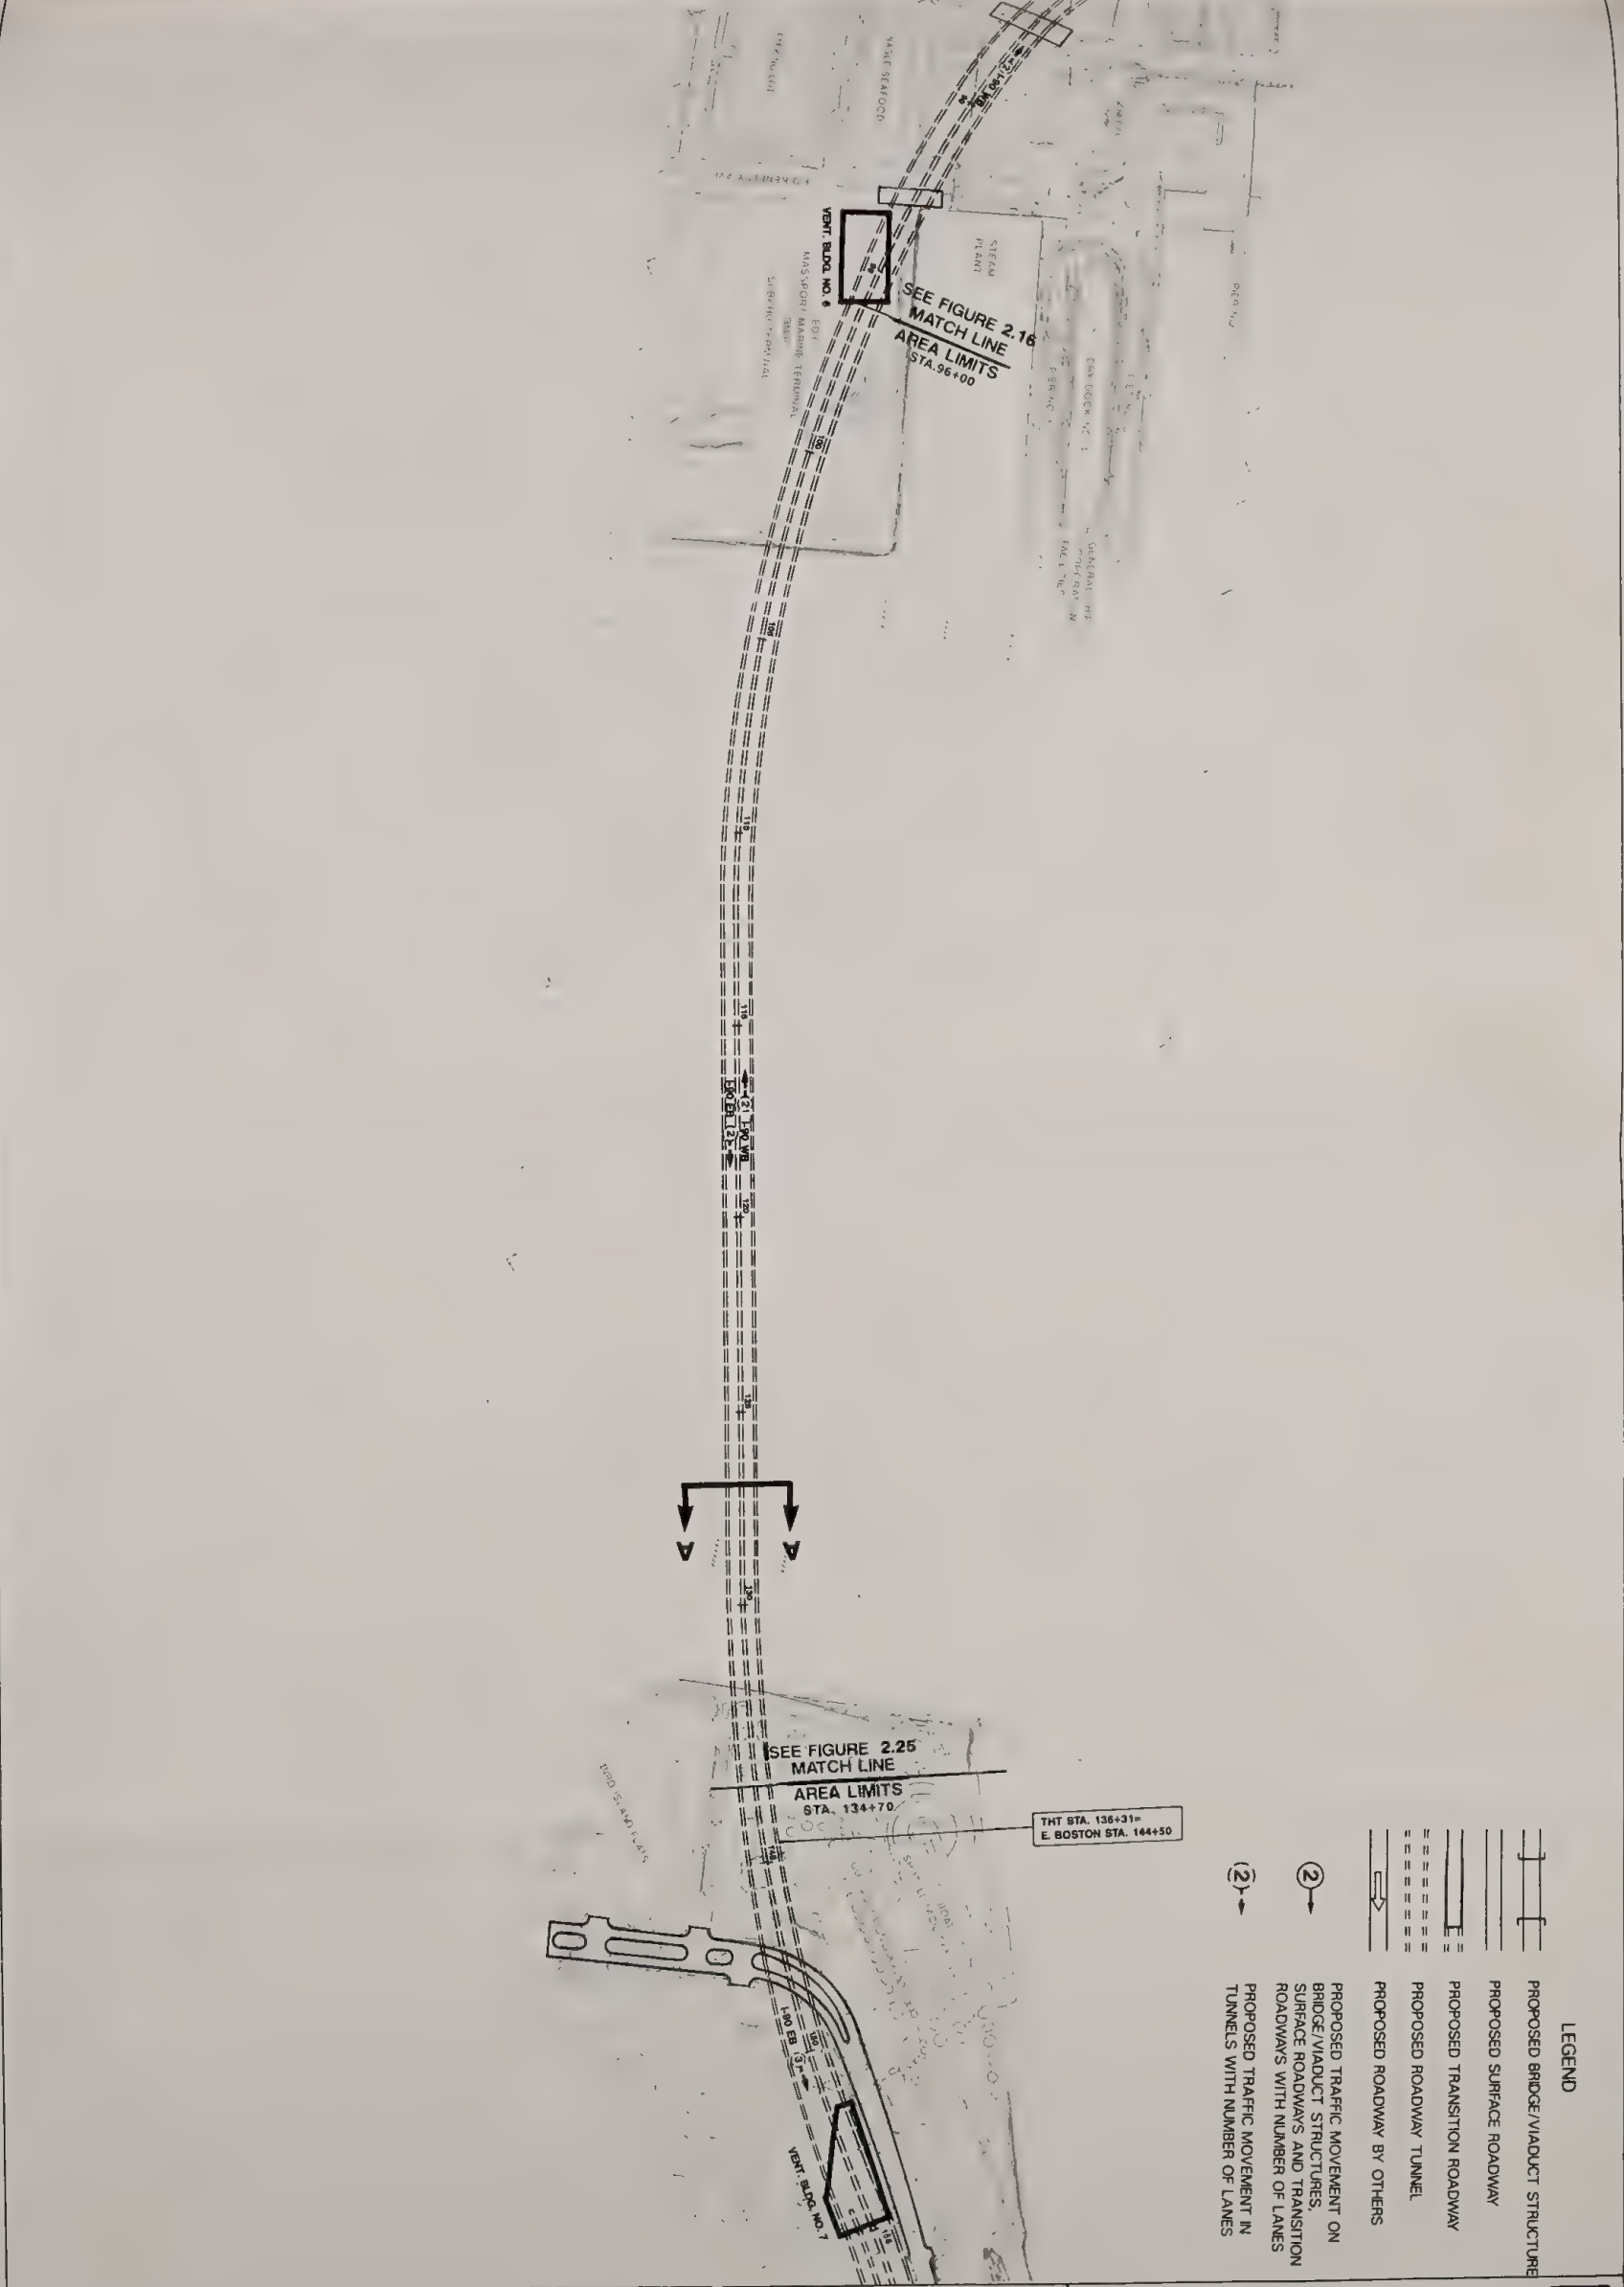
Third Harbor Tunnel Area Alignment
